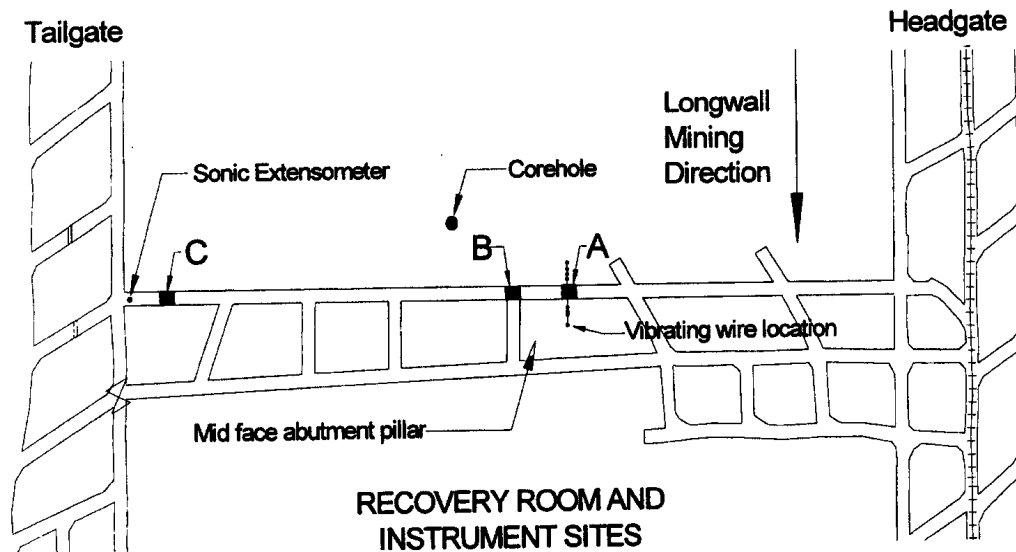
Full face recovery room at Pennsylvania mine "B", showing instrument locations. The face width is 305 m (1000 ft). The entry width is 6.7 m (22 ft).
